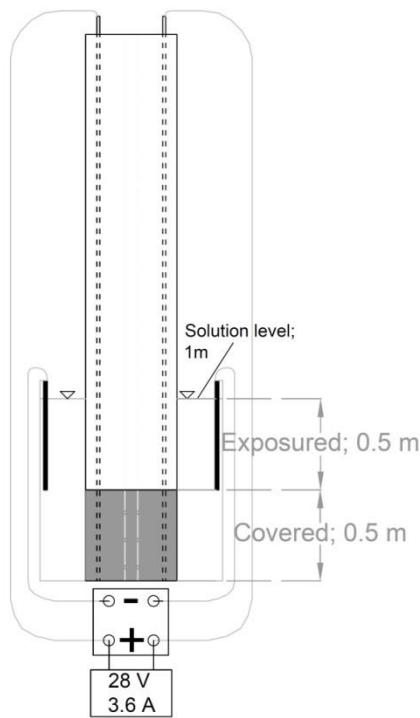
Details of accelerated corrosion process of the ECIP bridge pier
